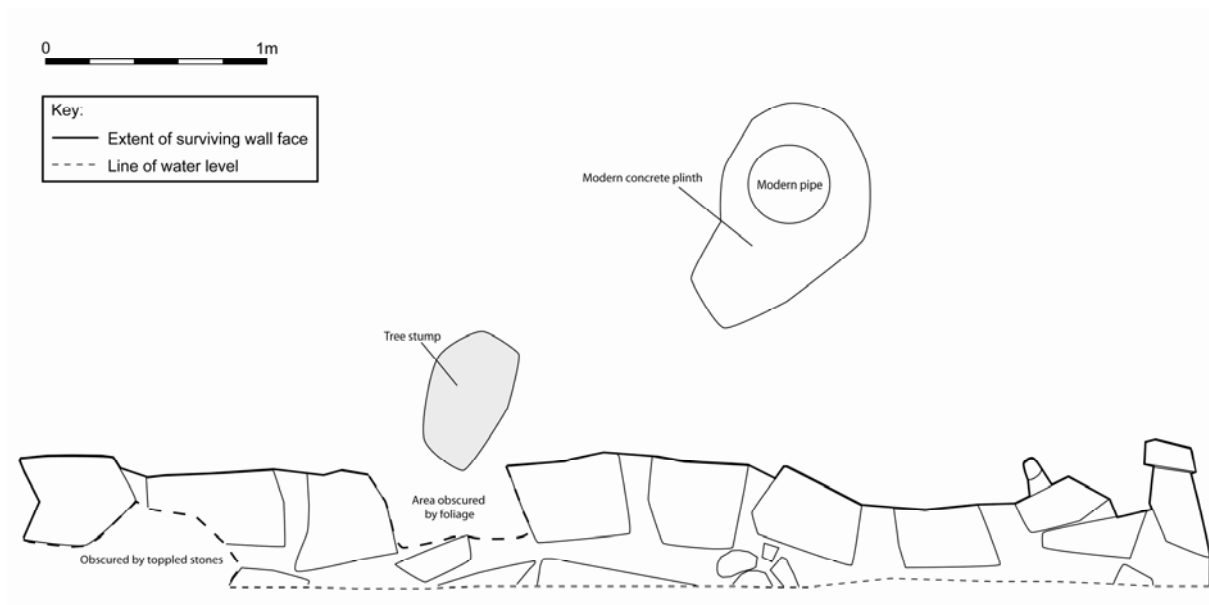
Structure 4, Rusticated Bridge #2 (Lower Bridge): Elevation b
